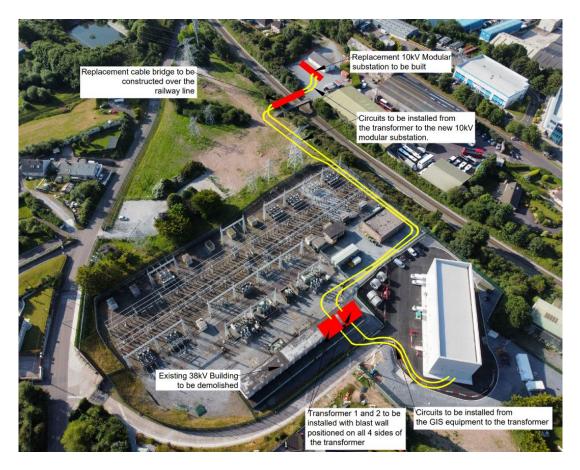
Proposed asset replacement and electrical infrastructure upgrading works
